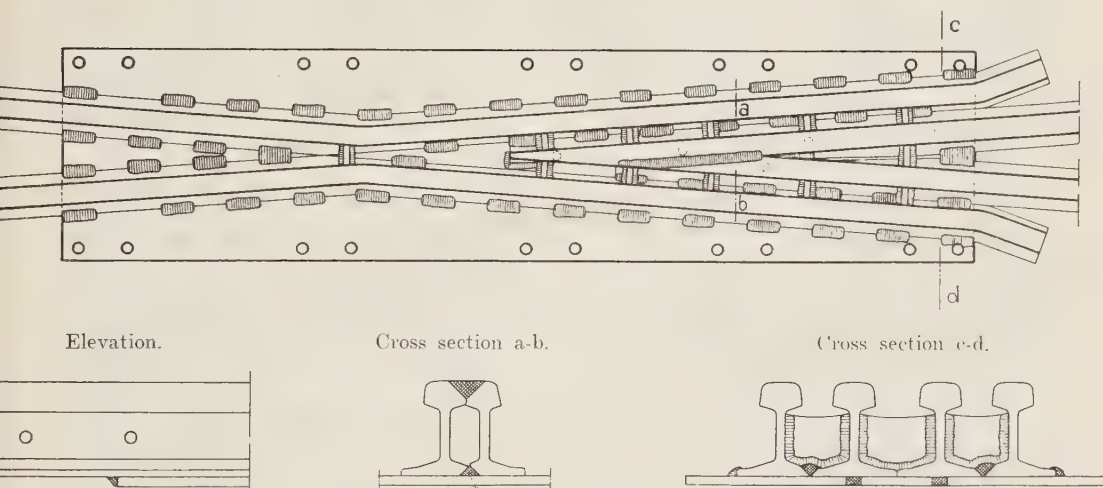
General arrangement and details of an acute crossing welded to a bearing plate (Manganese steel rails rolled by the *Aciéries de la Chiers*).
